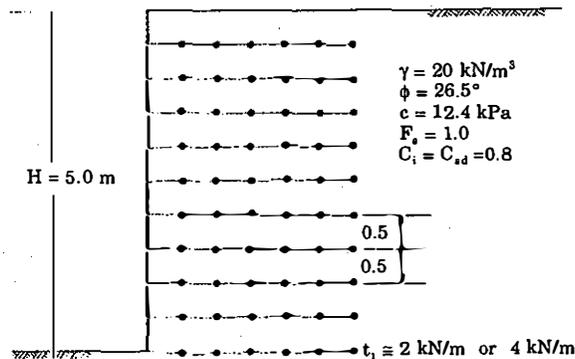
Layout for a cohesive slope considering *active* reinforcement forces.
